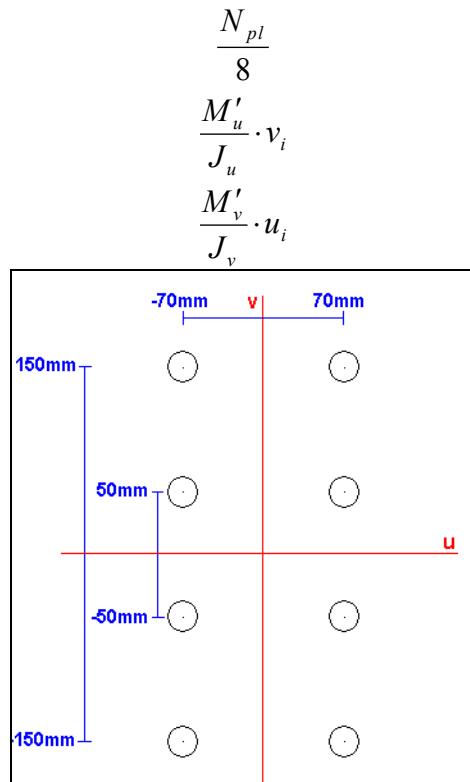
Bolts distances in bolt layout principal axes ref. system
